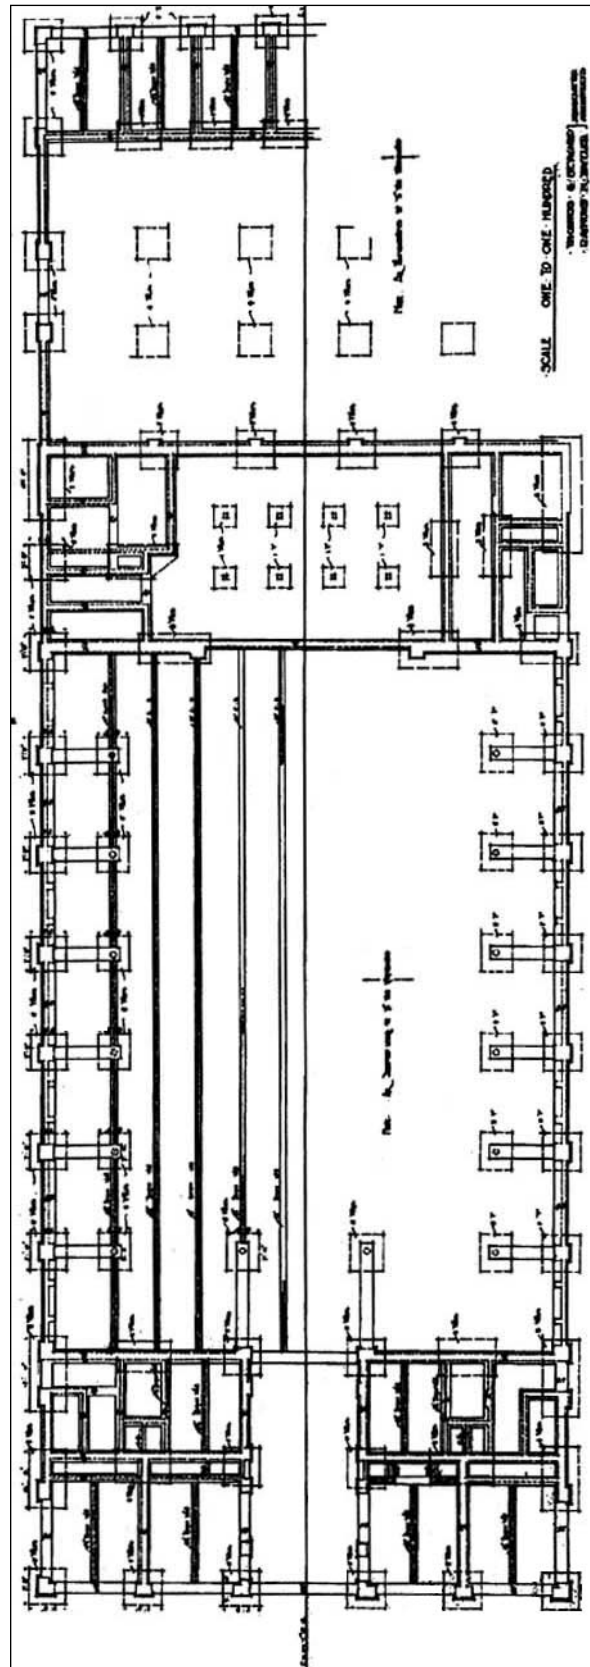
1914 foundation plan of City Hall (HCC Drawing A7¹)
